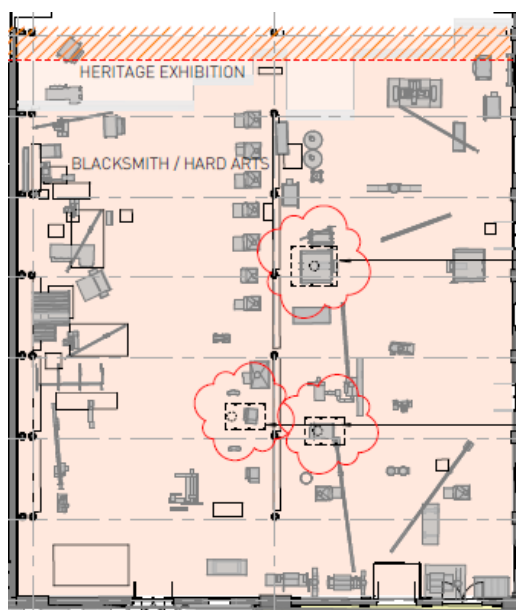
Proposed Ground Floor Plan showing the location and extent of the extraction hood and flues
